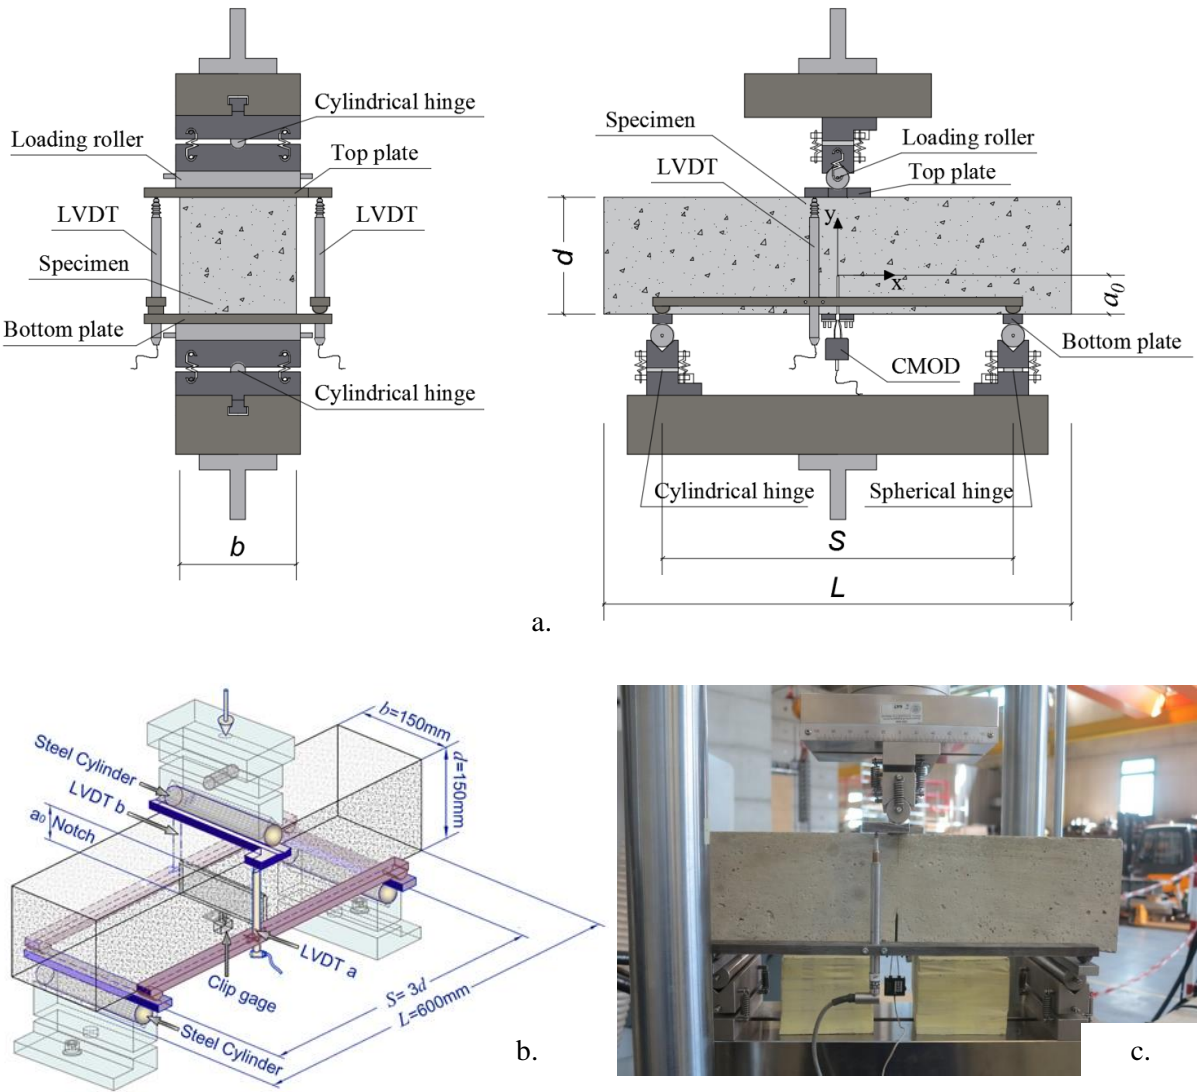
Fracture mechanics set-up: sketch (a), 3D view (b), and photograph (c).
